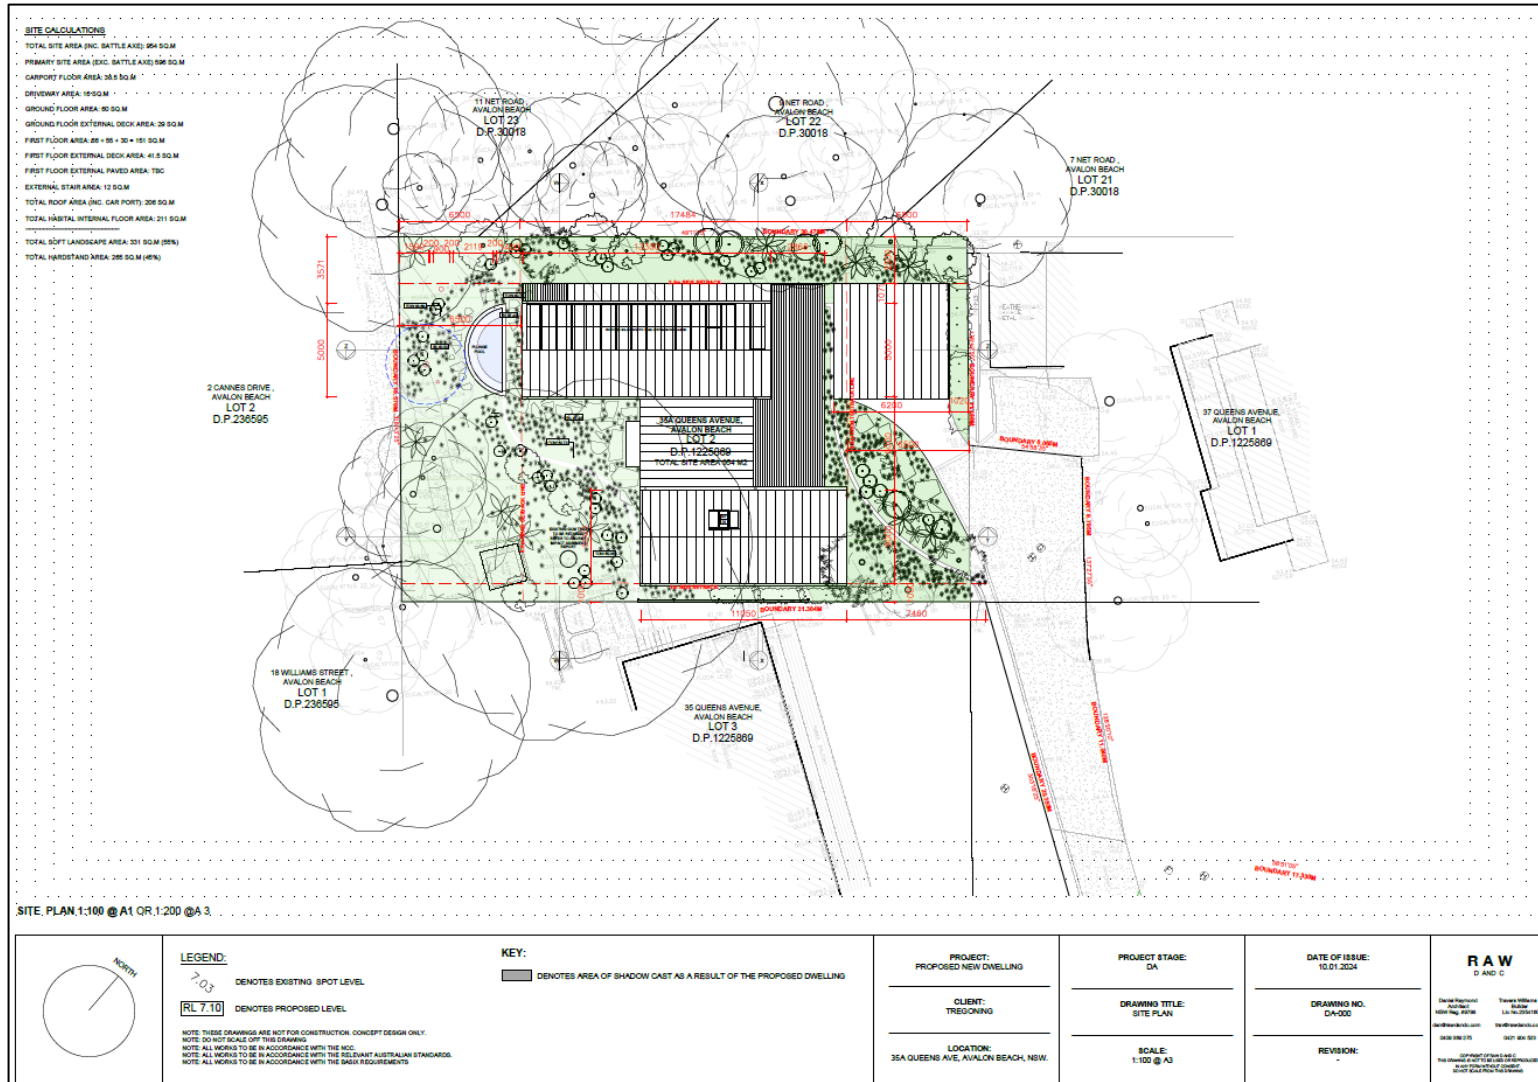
ILLUSTRATES PROPOSED SITE PLAN
